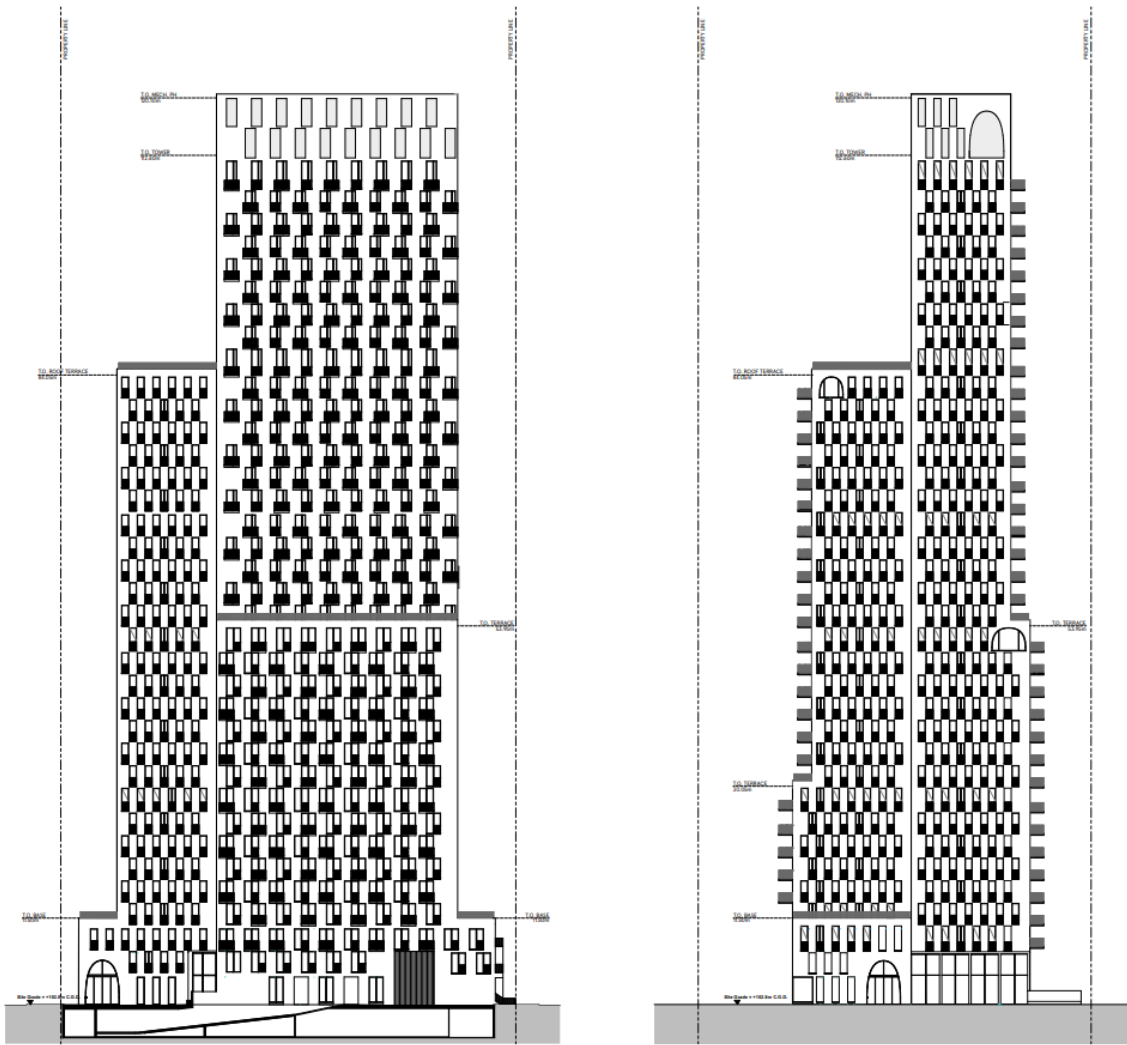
Proposed south elevation (left) and west elevation (right) of 405 Sherbourne Street (architects-alliance, Alison Brook Architects Inc., 2025).
